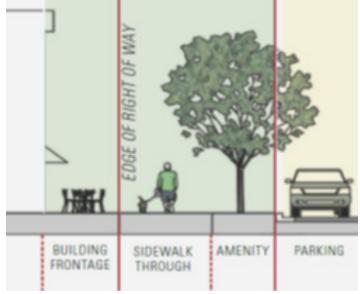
sidewalks should have an amenity zone adjacent to the street curb that accommodates street trees, and a building frontage zone adjacent to the building
